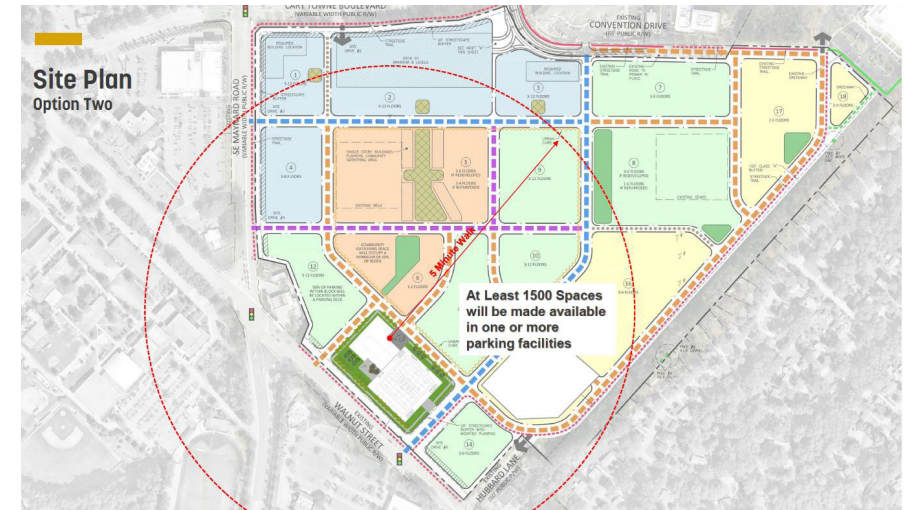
Cary Towne Center Mall Redevelopment Plan
